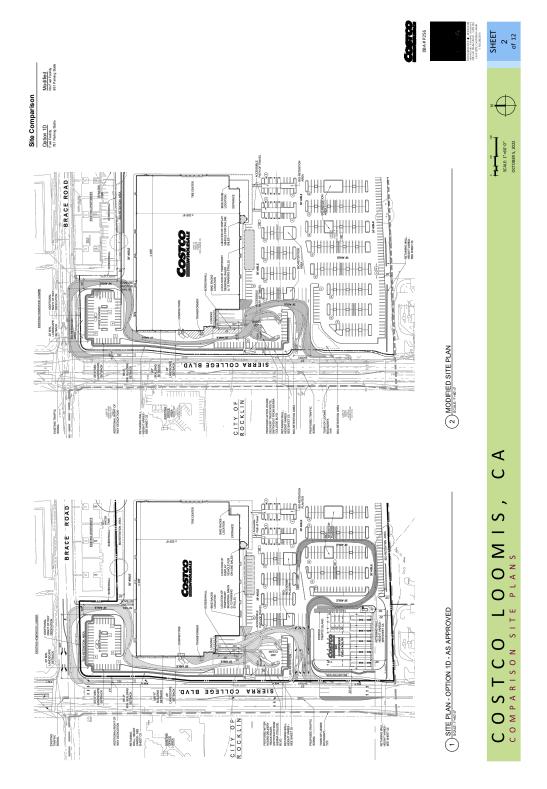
Comparison of Modified Costco Project Site Plan to Previously Approved Costco Site Plan
